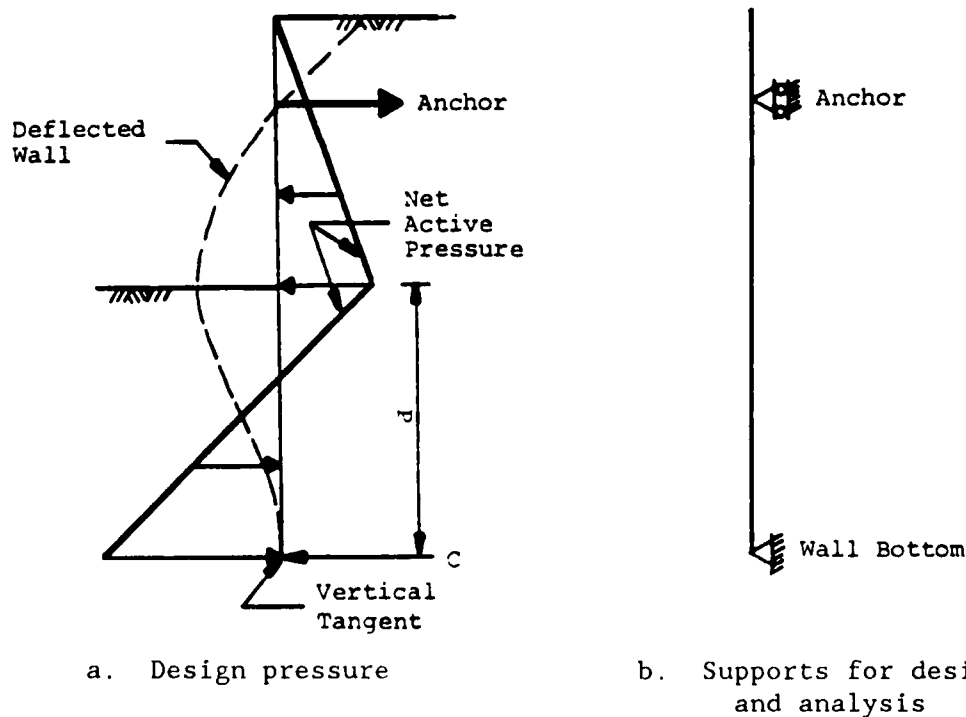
Anchored wall design by fixed earth (Terzaghi 1943) method
